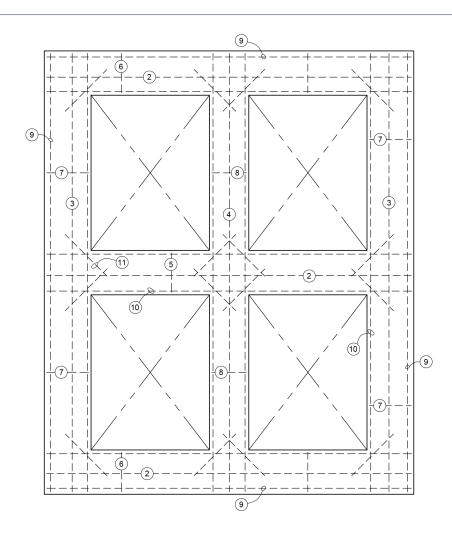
Engineer's reference panel elevations, showing typical reinforcement call-outs (continued on next page)
